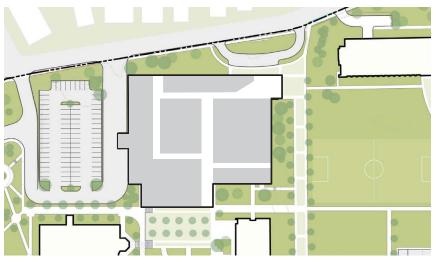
Berkshire Hall / Innovation Center site plan and interior circulation concept
